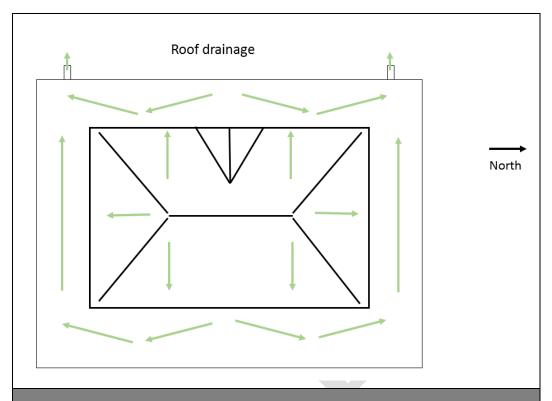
Roof plan diagram wih indication of roof drainage direction marked with green arrows.
